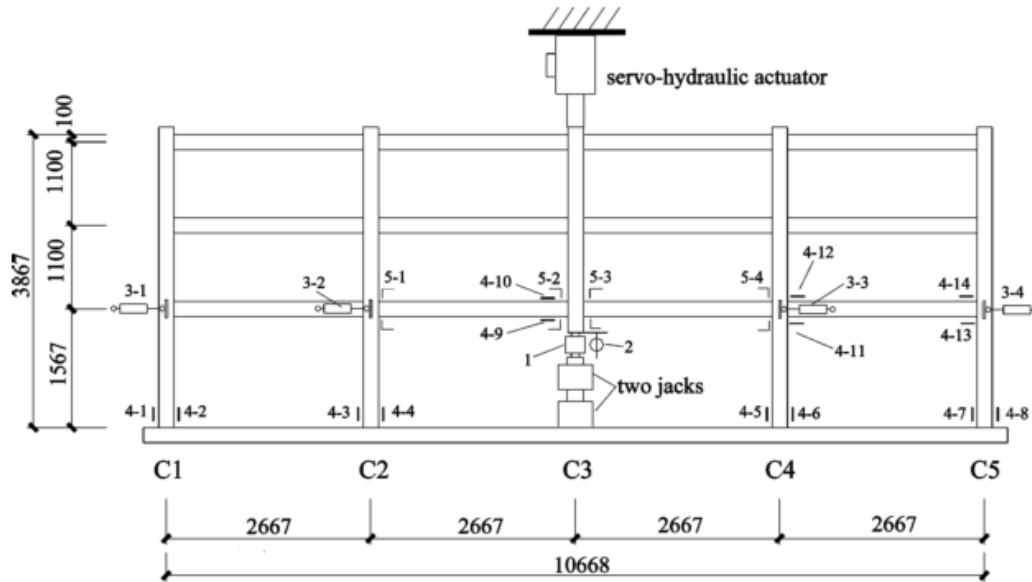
Test RC frame detail (Yi et al. 2008)
